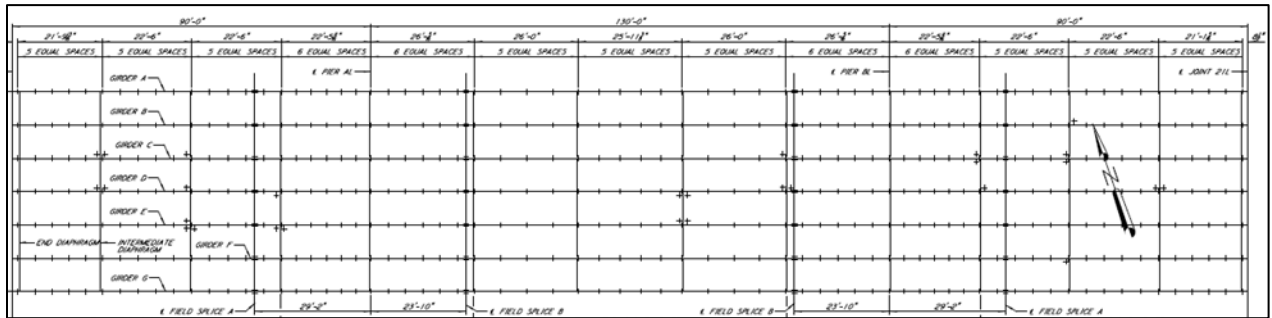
Eastbound Bridge Framing Plan (Spans 20-22)
